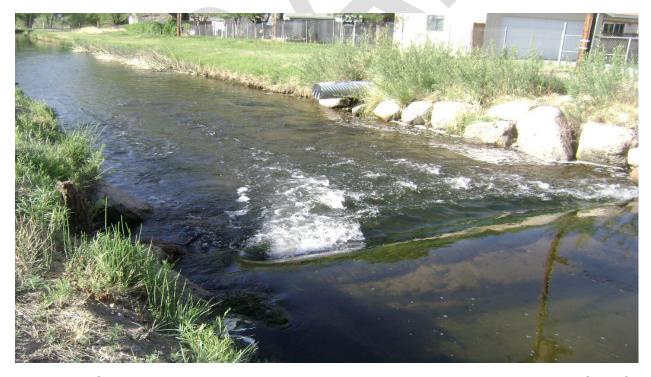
Concrete encased clay pipe submerged in water at a canal crossing. City of Bishop planned to replace this 15-inch clay pipe with a new 18-inch plastic pipe (more
